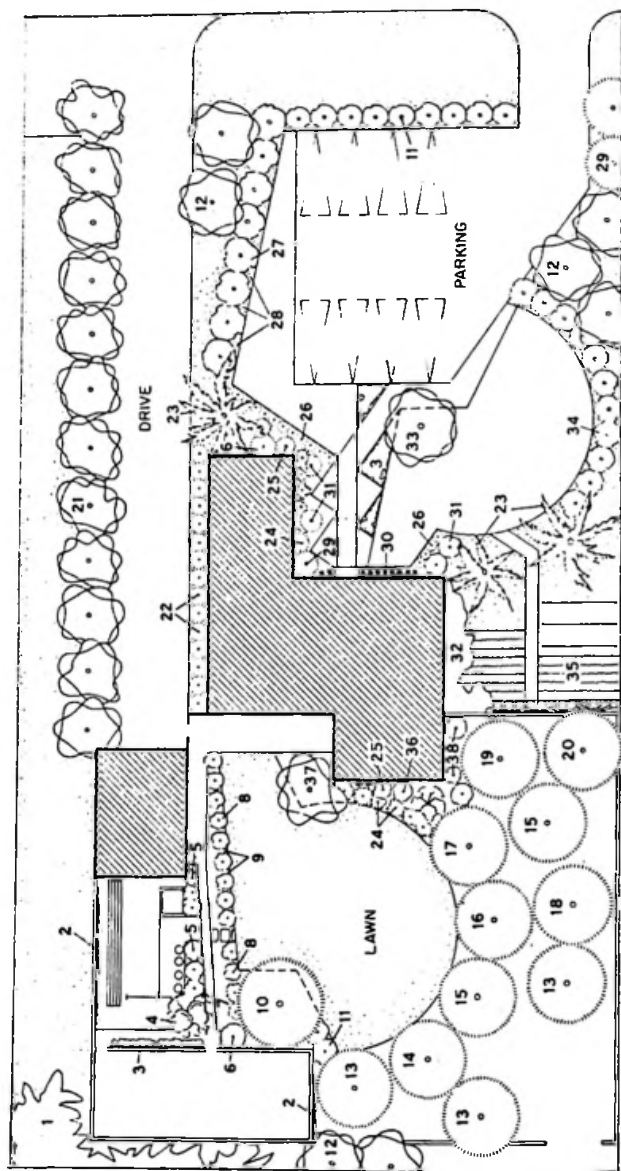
LAYOUT OF GROUNDS FOR A COUNTRY HOUSE
